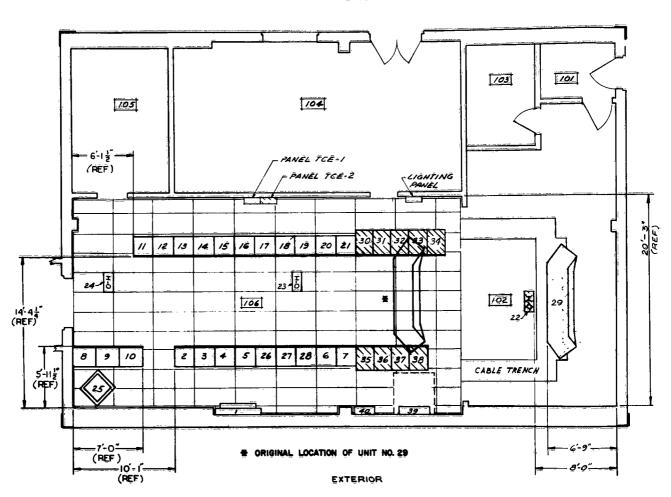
Floor Plan, UHF T/D Building No. 2 (FGS) 8-14
